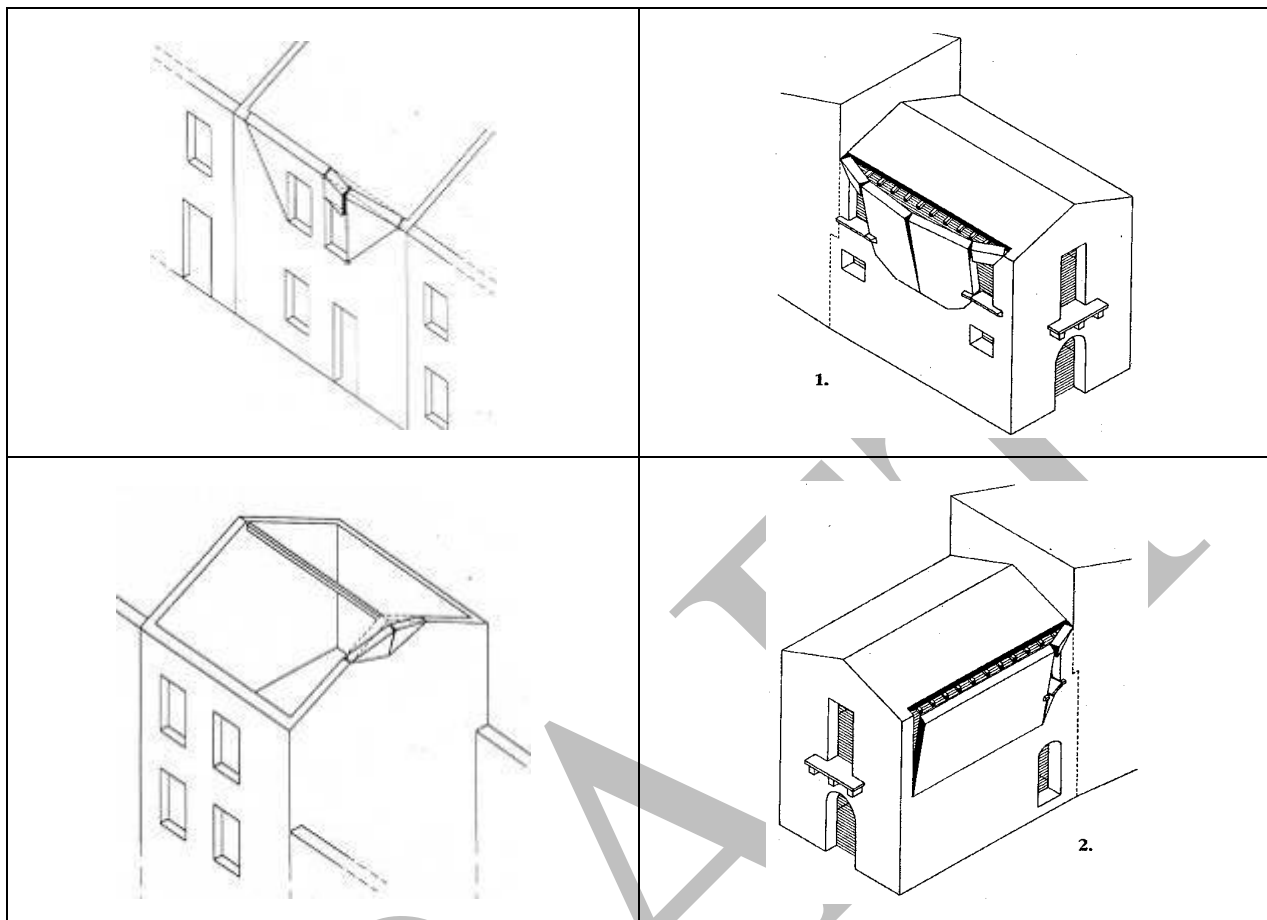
Class B – Damage to out-of-plane loaded walls: examples of sub-class B-b in case of top edge free.
